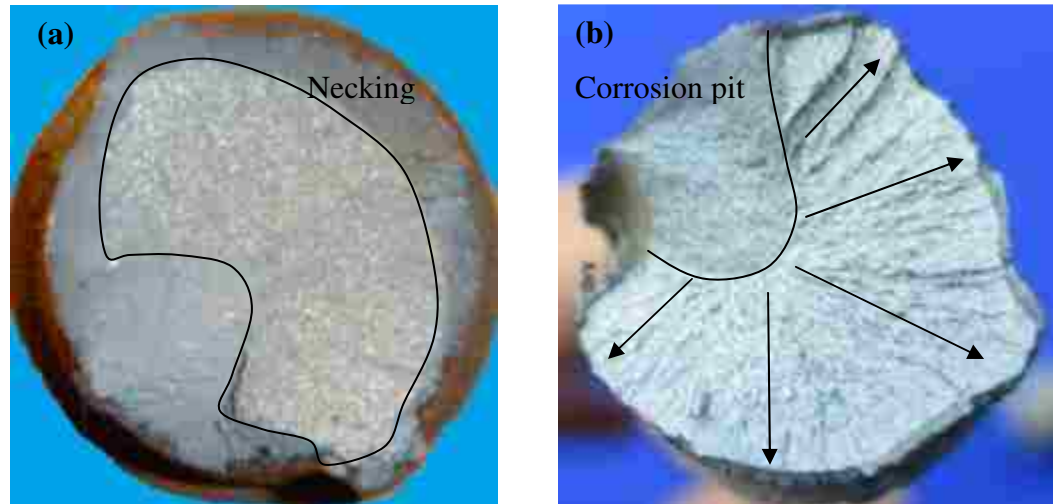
Fracture cross sections of (a) uncorroded and (b) corroded steel bars after tensile tests.
